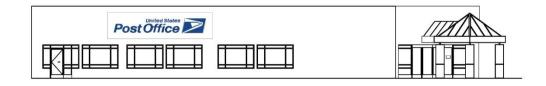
Typical Elevations Showing Primary Signage Locations for CSF Medium Plans
